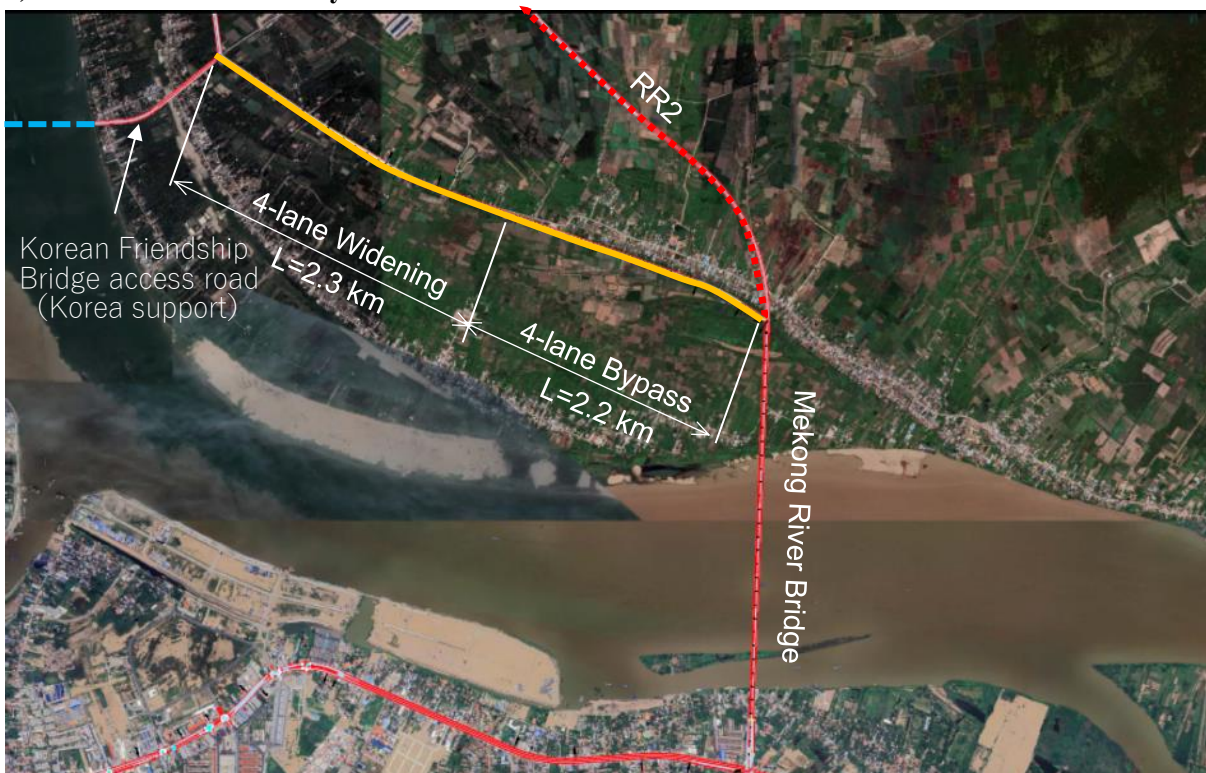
Road Plan in Akreiy Ksatr City
